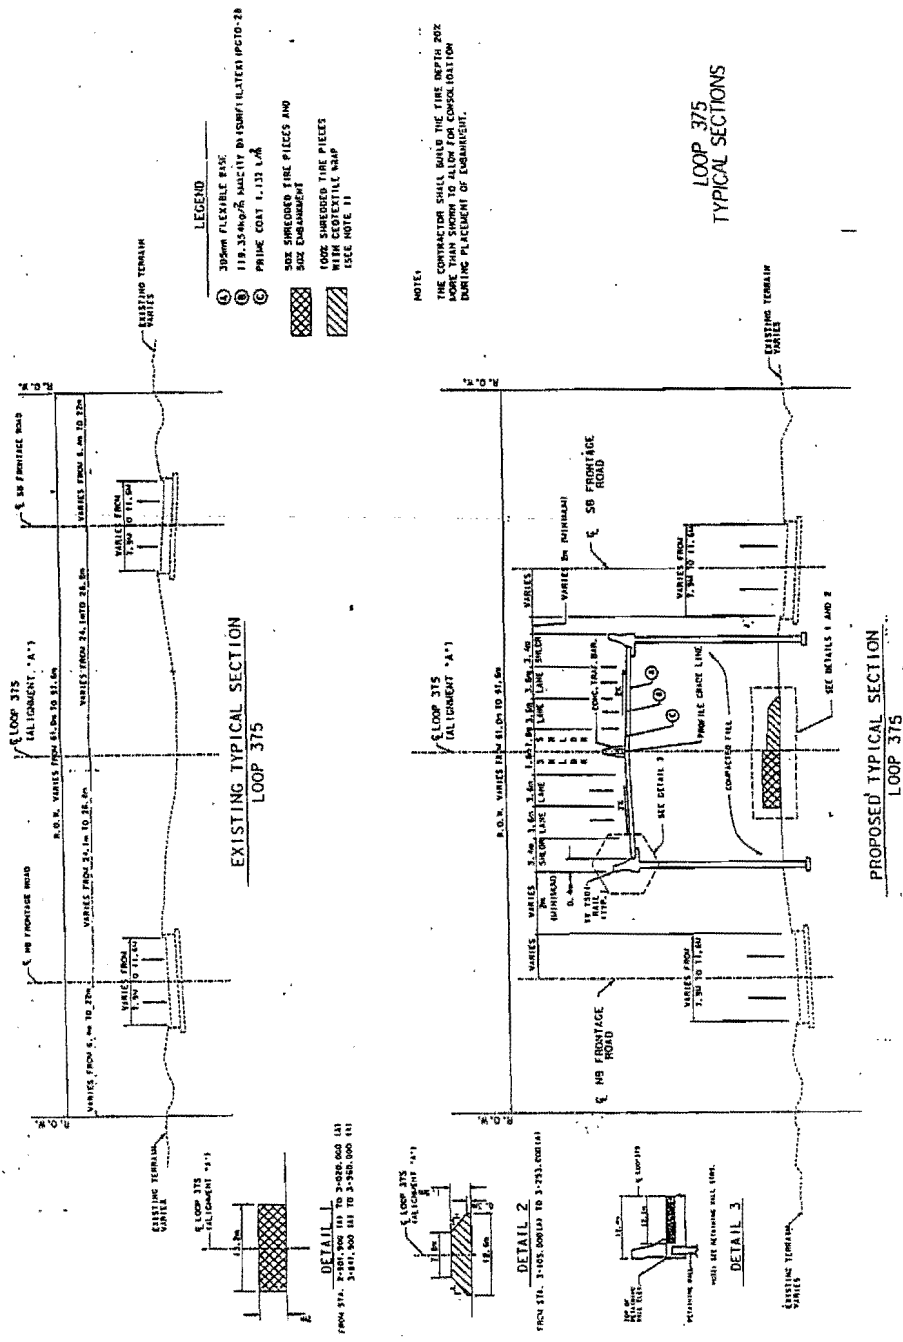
Existing (above) and Proposed (below) Typical Sections
